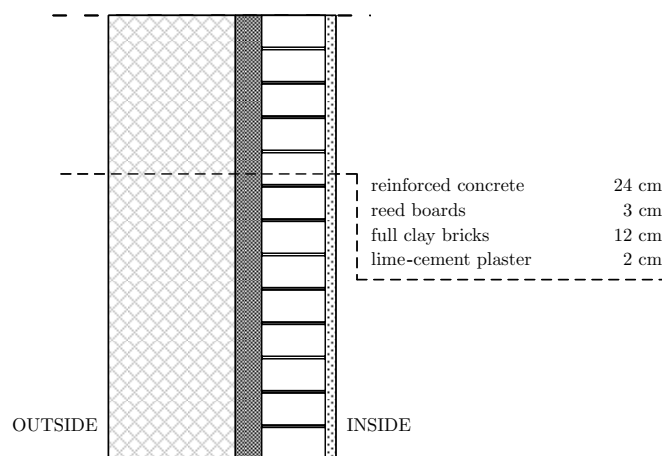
East- and west-facing external walls from the ground floor to 13th floor (EW2).
